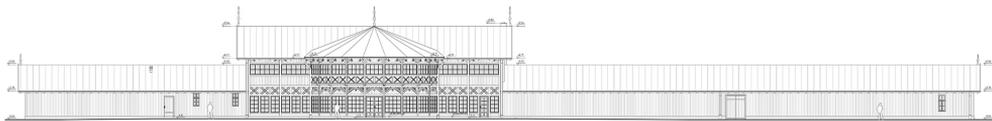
Northern elevation of the shooting pavilion (Source: PKZ ARKONA Sp. z o. o.)
